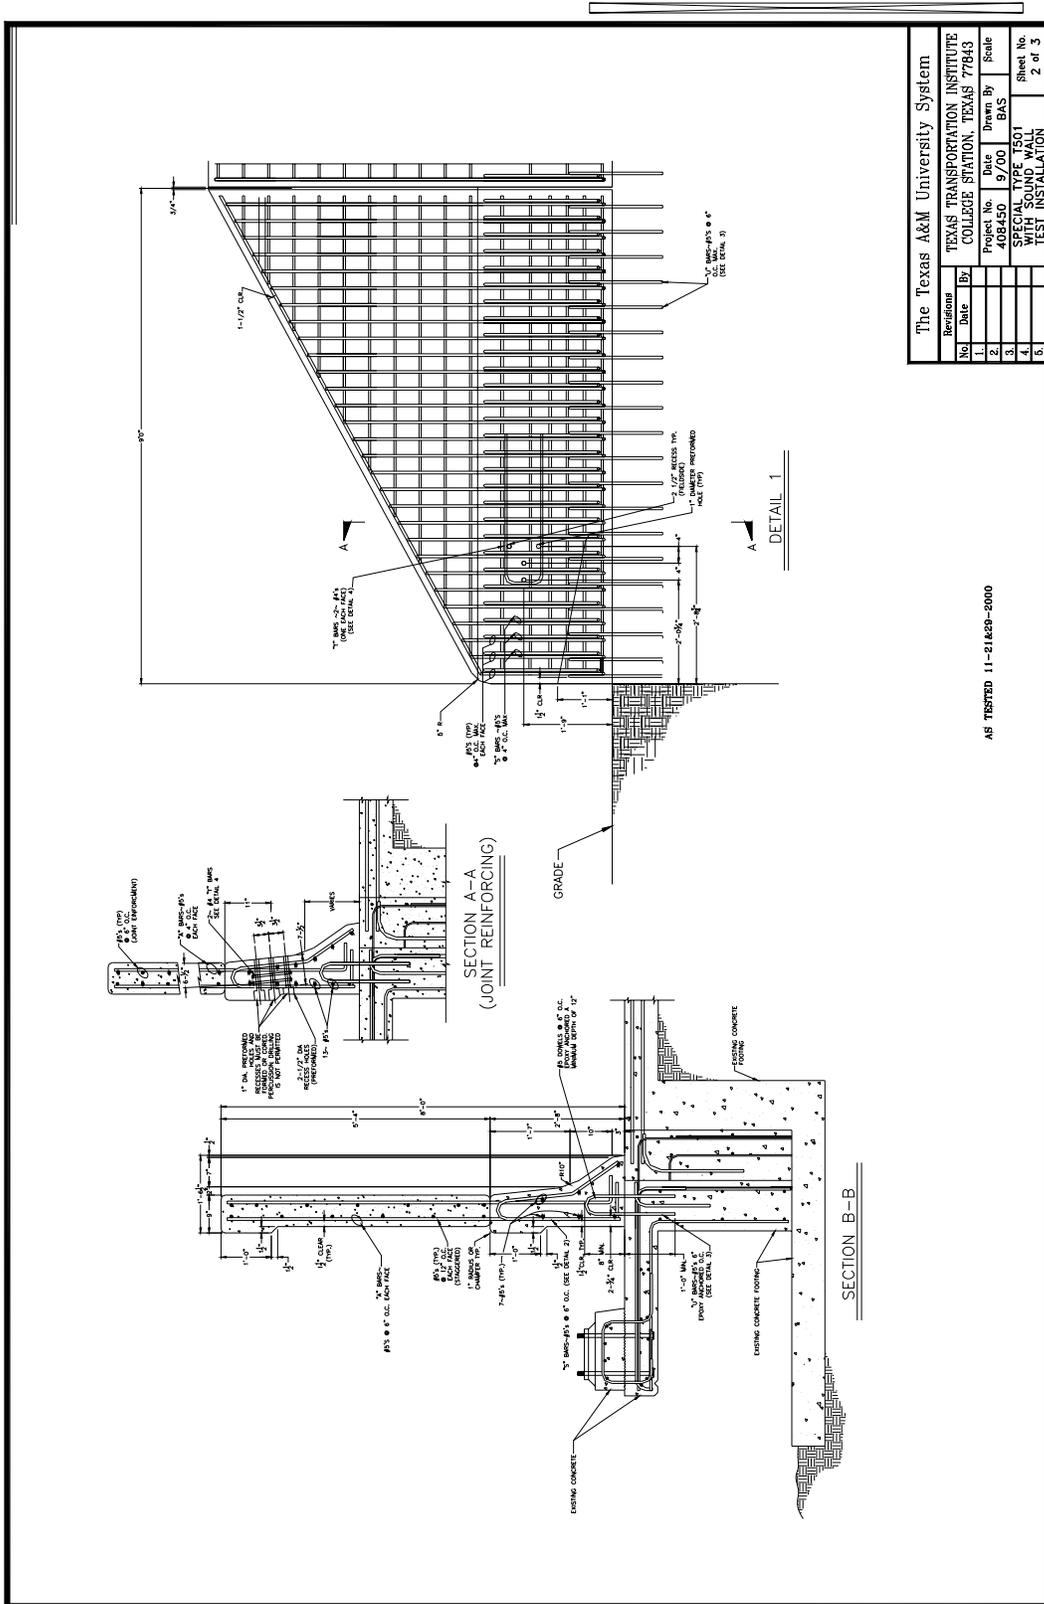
Details of the T501 Bridge Rail with Soundwall (continued).
